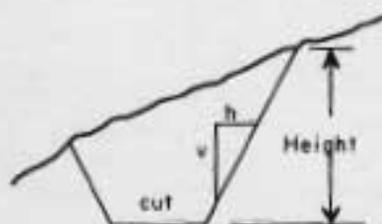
Maximum unsupported height of steepest slope of cuts
